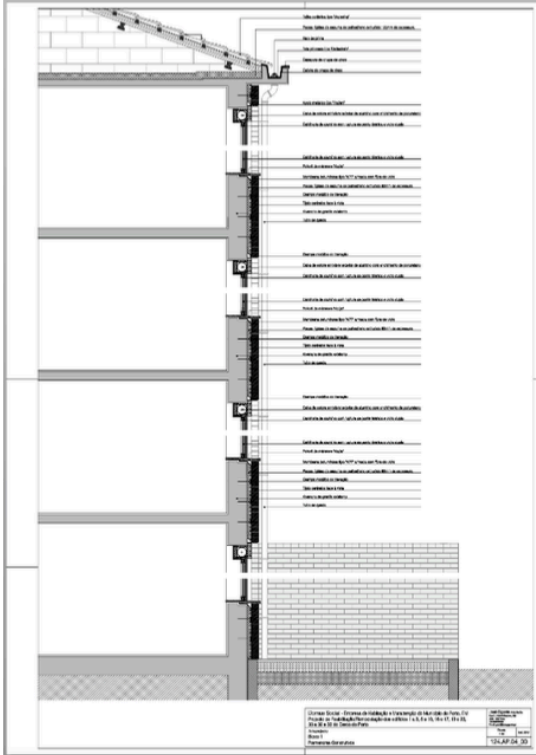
Intervention by José Gigante. Constructive details (Courtesy José Gigante)
